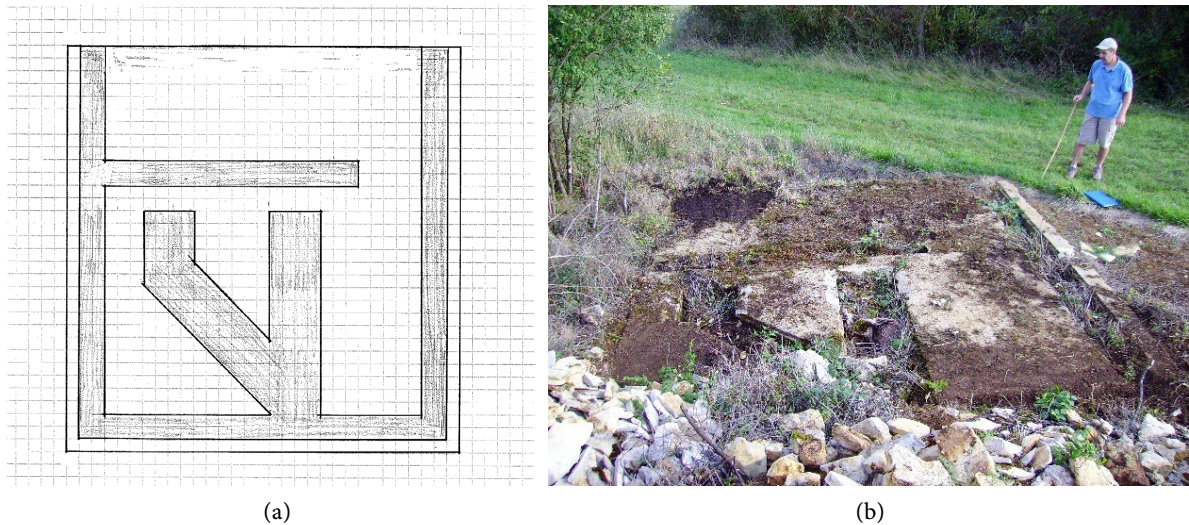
Emplacement (5)—(a) concrete platform plan, transformer—power plant. (b) thick slab with U- and Y-shaped grooves.
